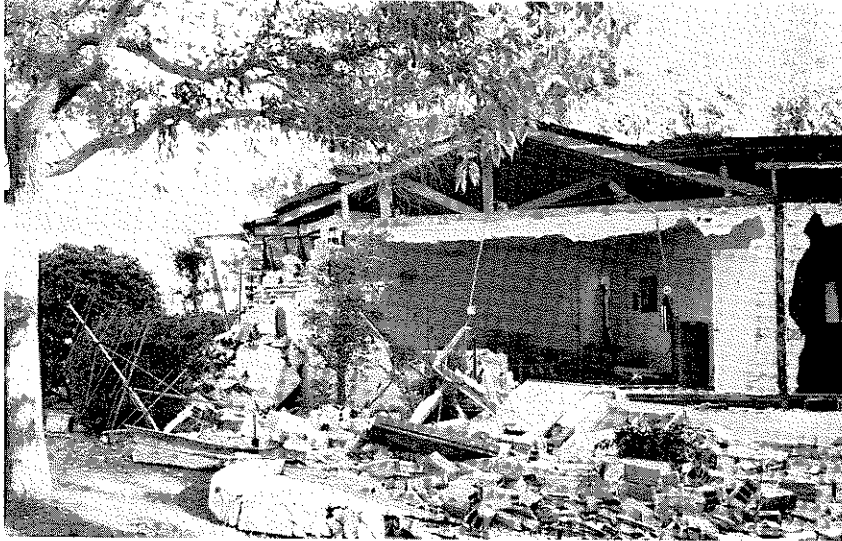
Partly collapsed wood frame and tile Guest House, Veterans Hospital.
